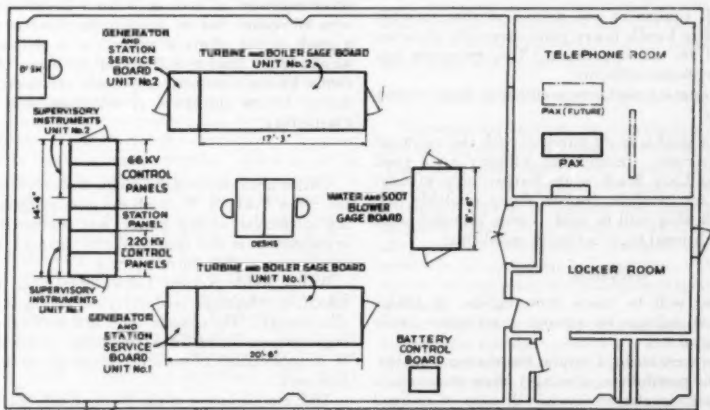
ETIWANDA CONTROL-ROOM LAYOUT SHOWING COMPACT TURBINE-BOILER ELECTRICAL CONTROL BOARD
